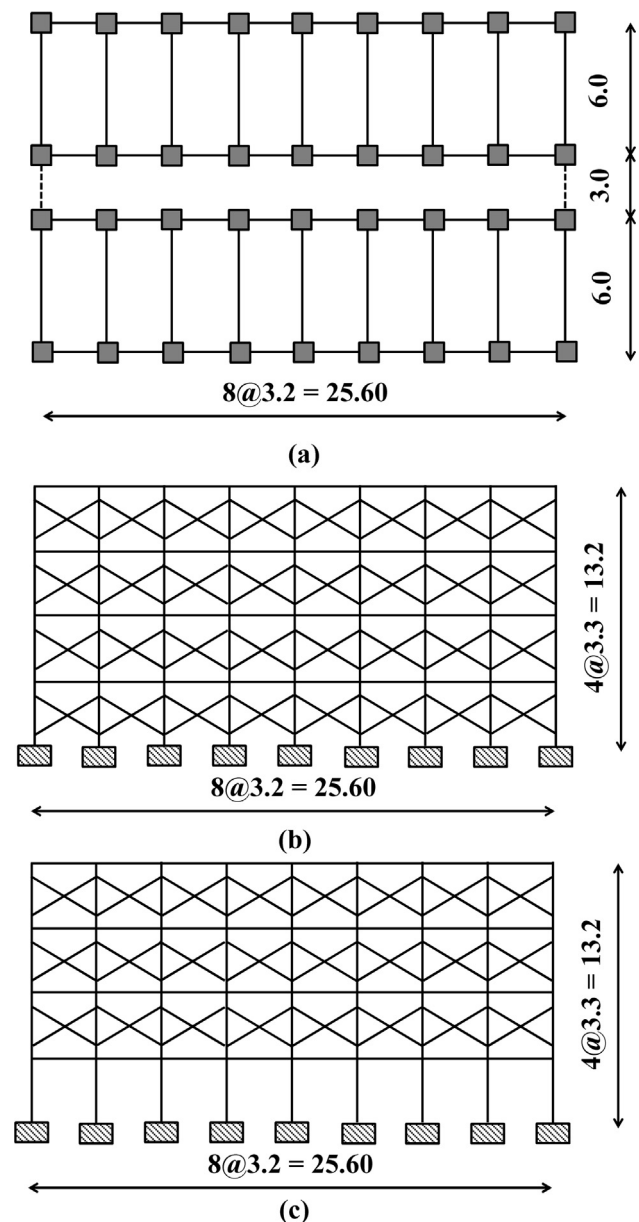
(a) Generic plan; (b) schematic elevation in longitudinal direction, for a 4 storey UI RC frame building; and (c) schematic elevation in longitudinal direction, for a 4 storey OGS RC frame building. Elevations in the transverse direction are not shown here for brevity. (The dashed lines in the floor plan represent the floor slab boundaries, which are assumed to be rigid in plane. The inclined lines in elevations represent the infills. All dimensions are in meter.)
